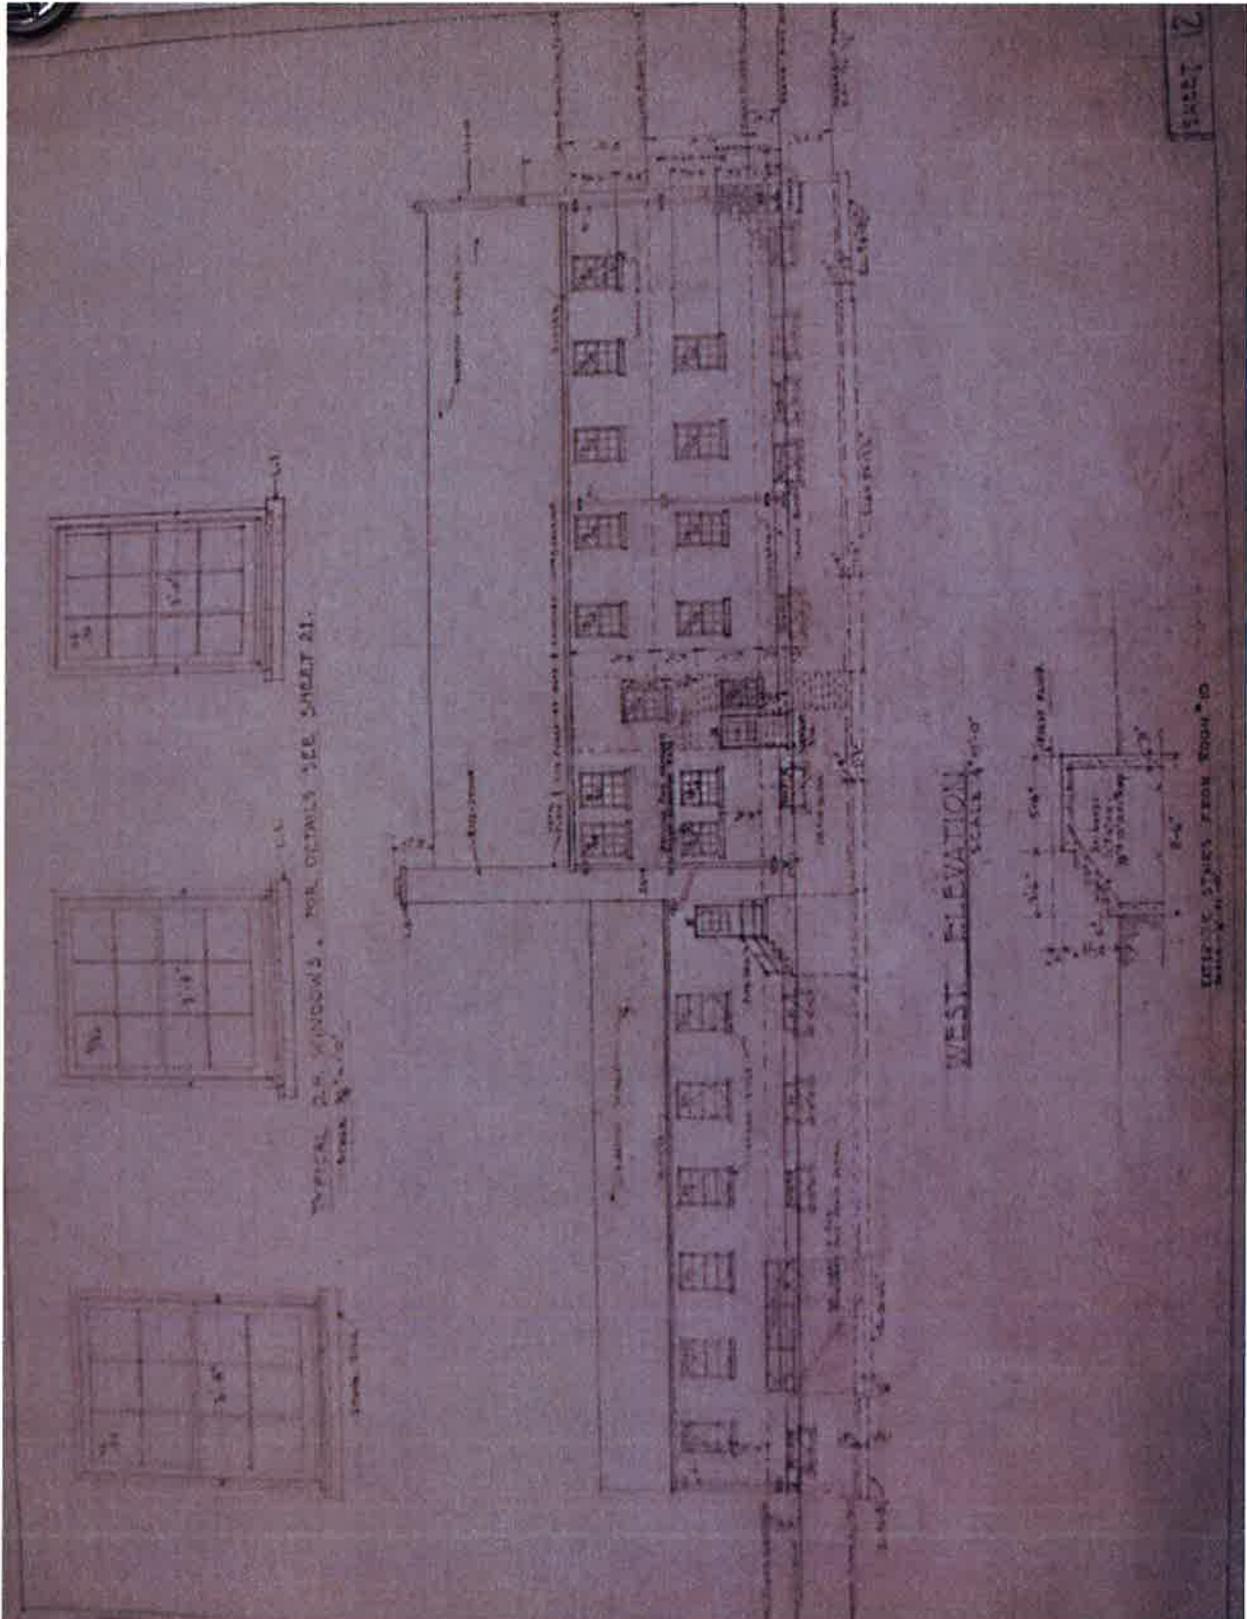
West Elevation Plan View, 1946 (Courtesy of Carl & Mary Koehler History Center, Cedar Rapids, IA)
